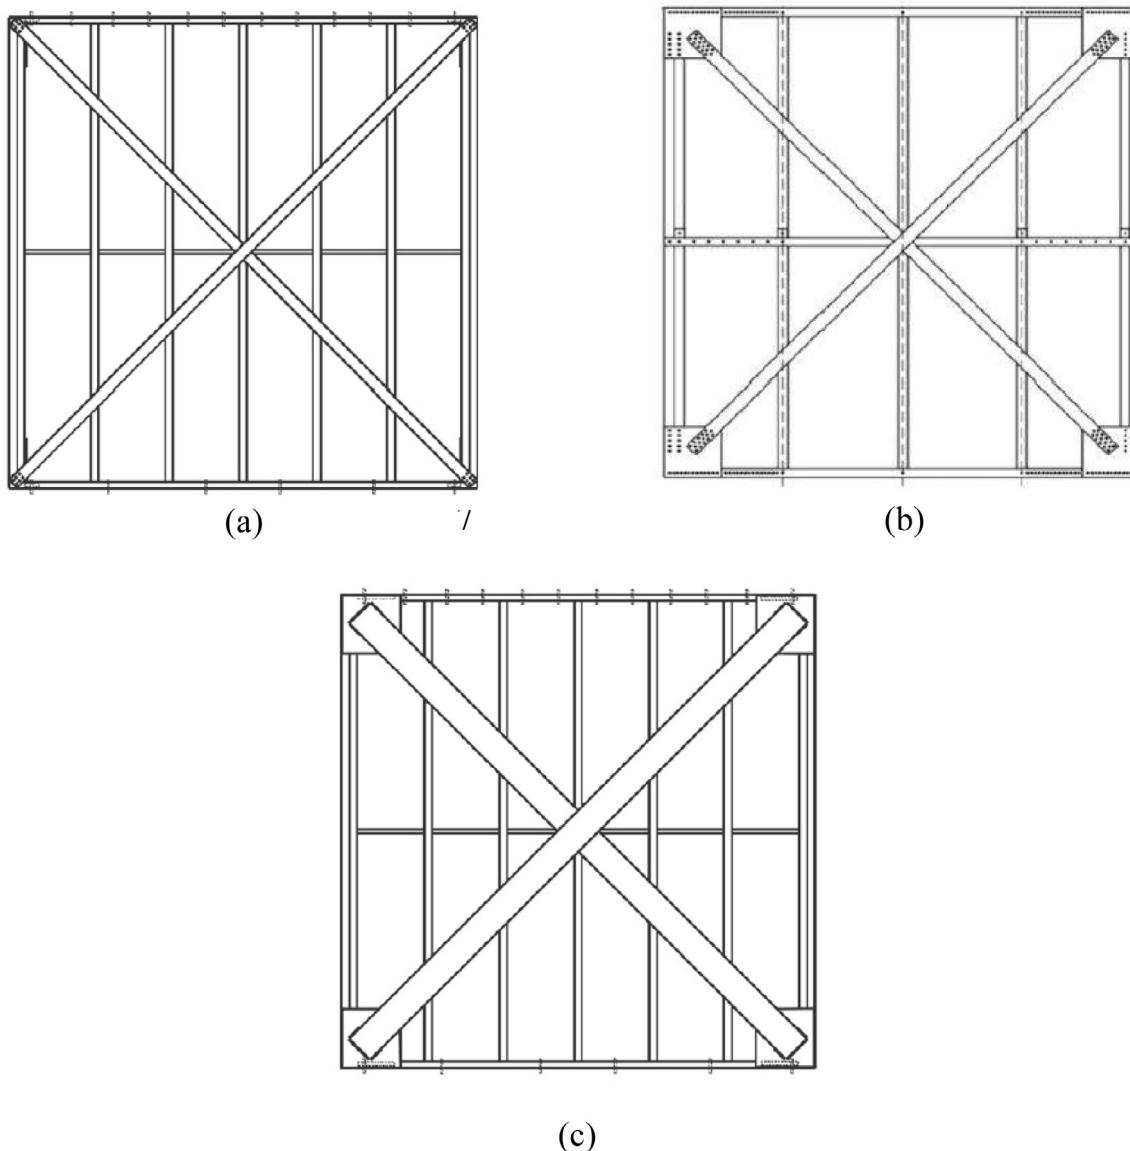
Different types of strap-braced walls' connections: (a) simple screws [38] (b) all-screw connected through gusset plates [21] (c) all-welded with gusset plates [38].
